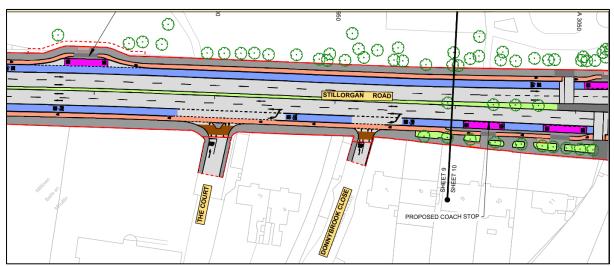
Extract from General Arrangement Drawing at Donnybrook Close (Sheet 09)
